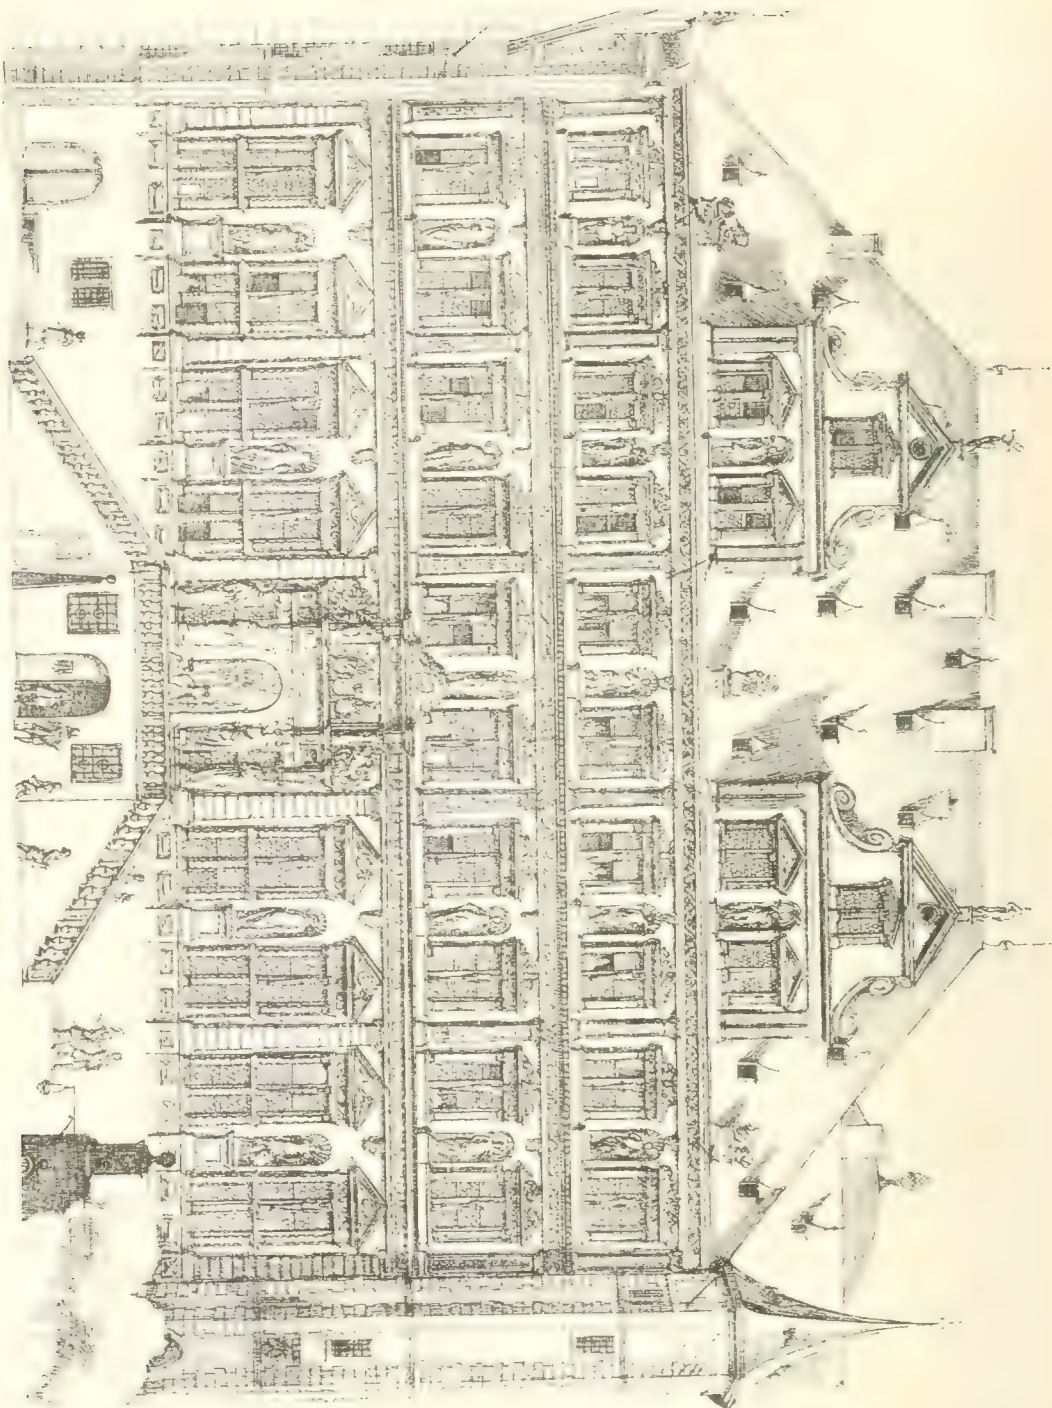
ELEVATION OF THE BUILDING ON THE WEST SIDE OF THE STREET.
